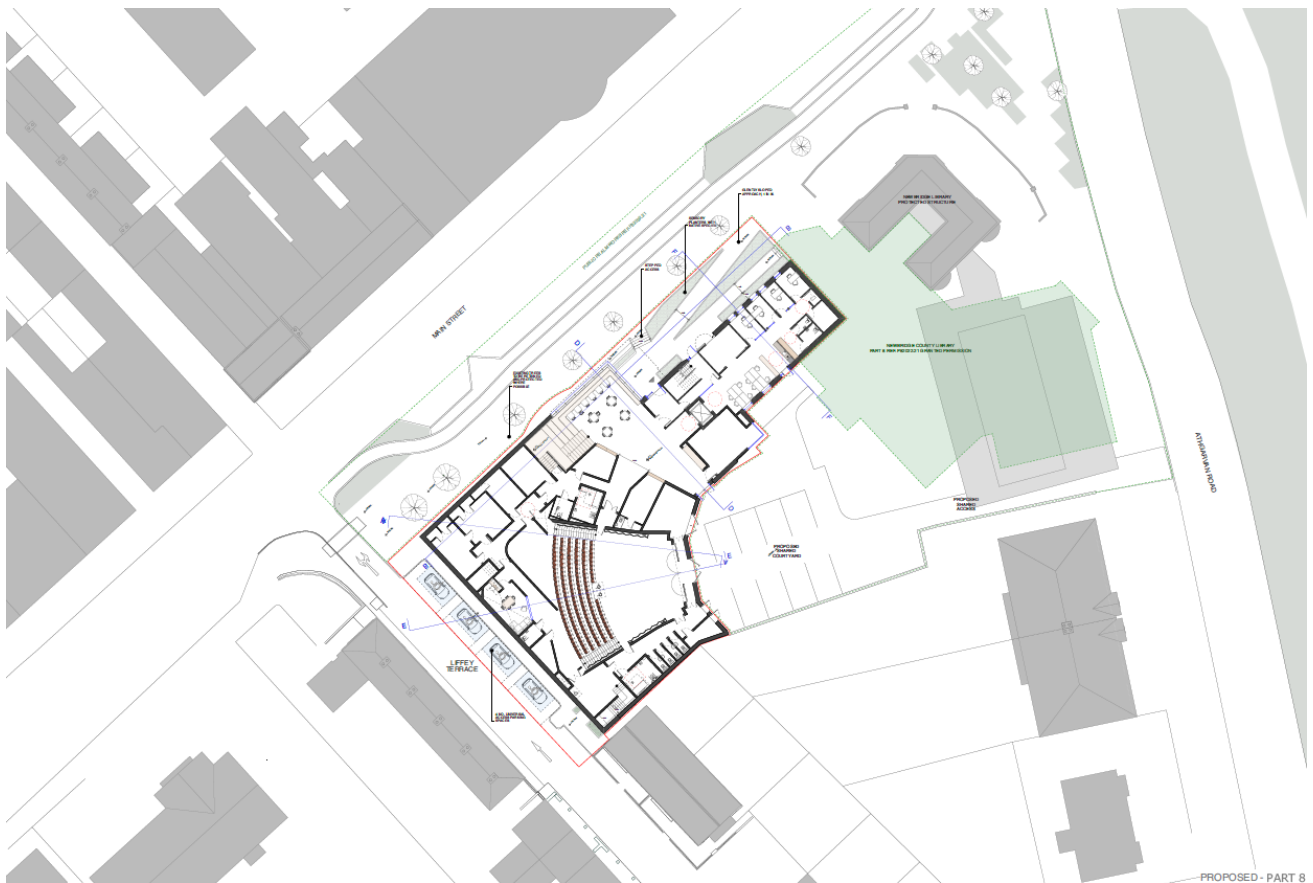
Site Layout Plan for the proposed redevelopment of the Kildare County Arts Centre at the Riverbank Arts Centre, Newbridge. (Source: Studio Red Architects)
